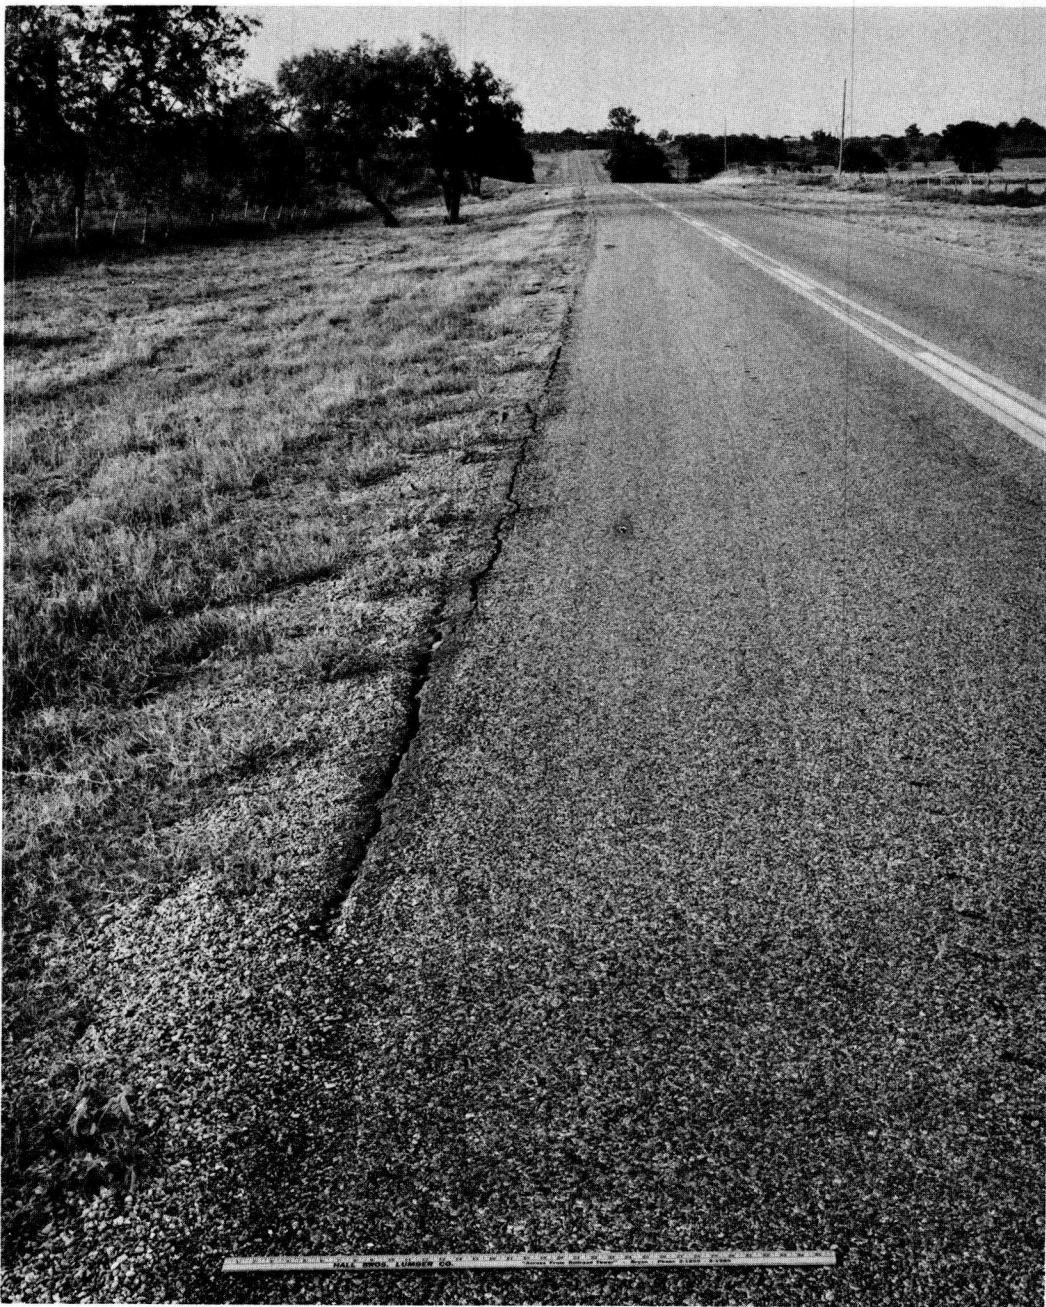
On this highly plastic clay, shrinkage cracks form at edge of pavement surface.
